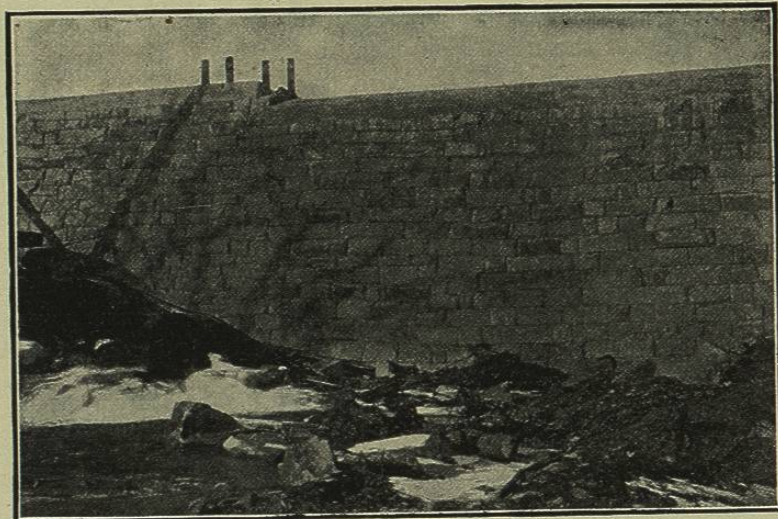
ALFRED DAM, ME. DRY ROCK MASONRY WITH CONCRETE FACING AND CREST.
